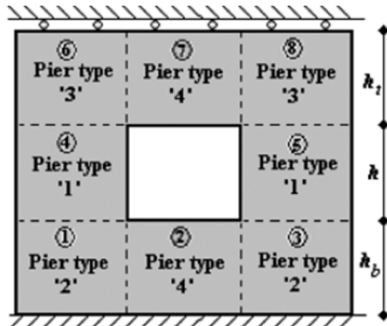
Different Types of Masonry Piers, Balasubramanian [25]
